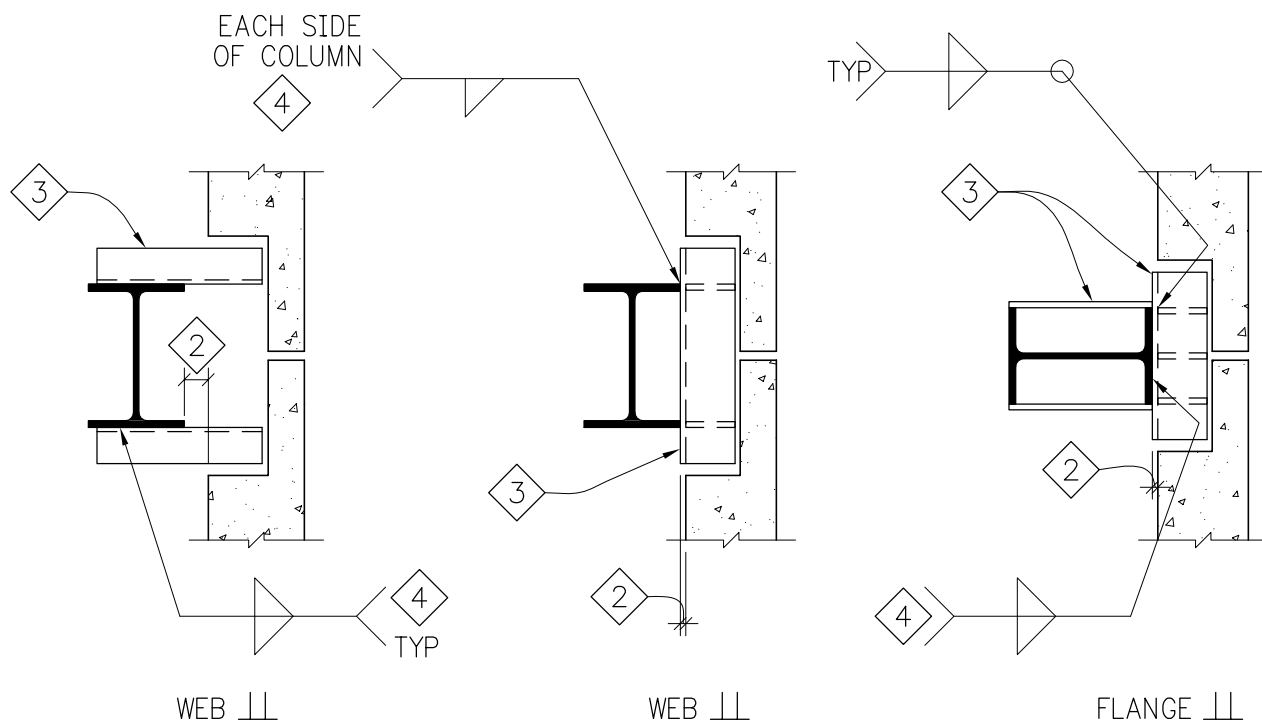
PRECAST CONCRETE CONSTRUCTION ISSUES - CASE B
